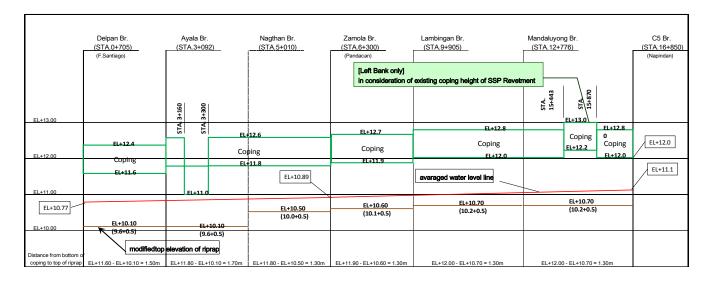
Design Elevation of Coping Concrete and Riprap
